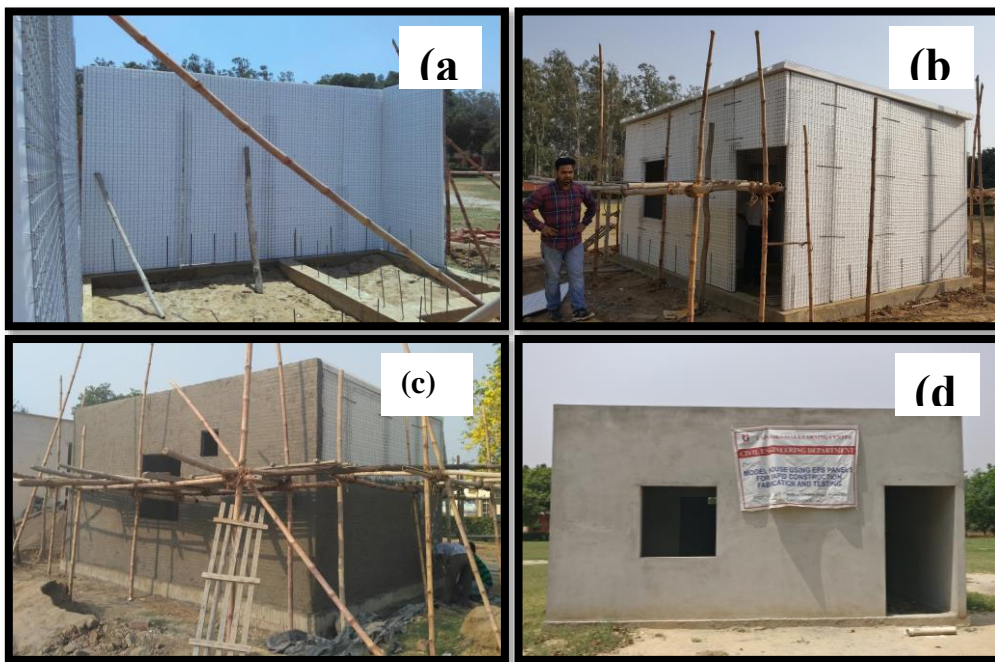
5: Shuttering and concreting on EPS (a) Erection of panels; (b) erect panels with roof slab; (c) plastering of sandwich panels; (d) final building
